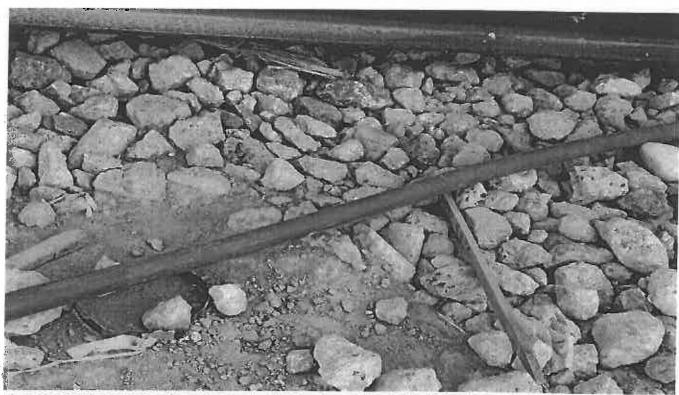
Ongoing pumping of muddy groundwater from foundation footing into active stormdrain onsite.
